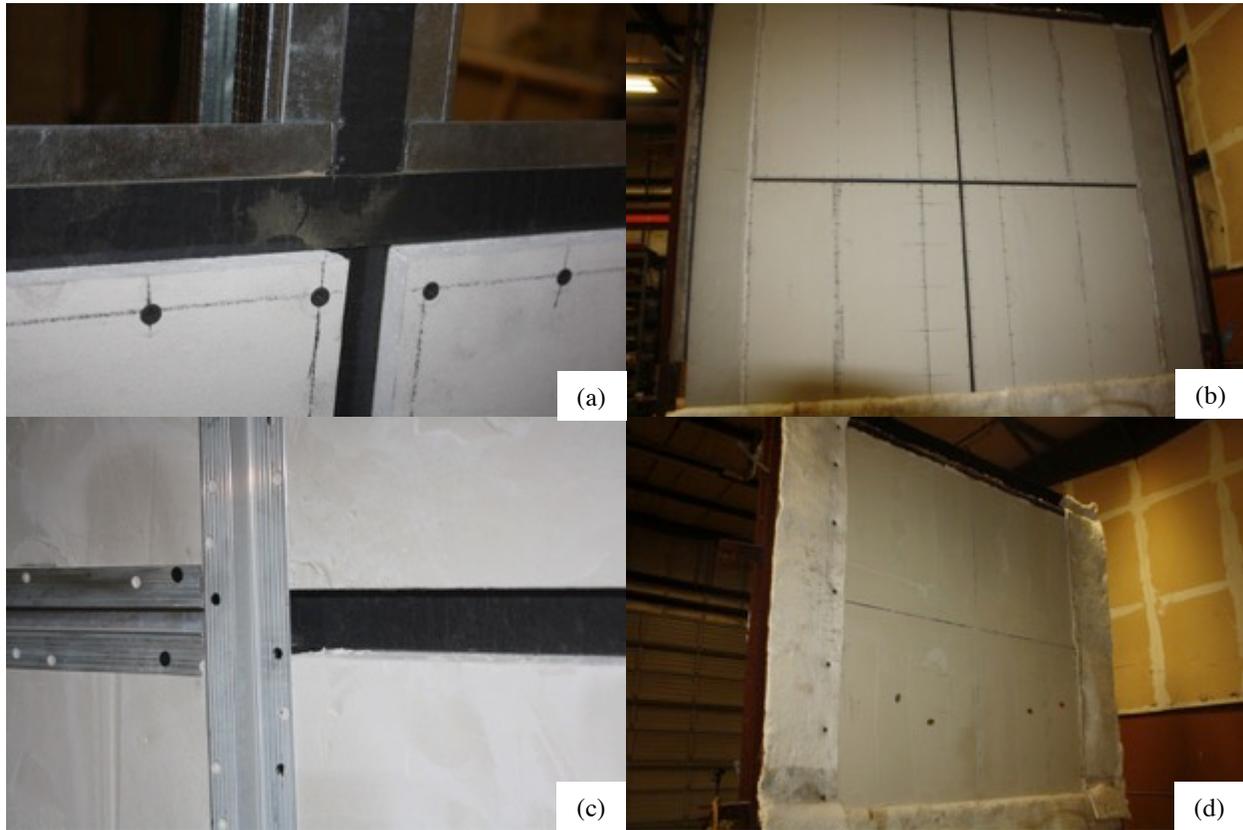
Construction photographs showing (a) center FSB joint with single layer of GWB, (b) wall before compound, (c) installation of DRM trim, and (d) completed assembly.
